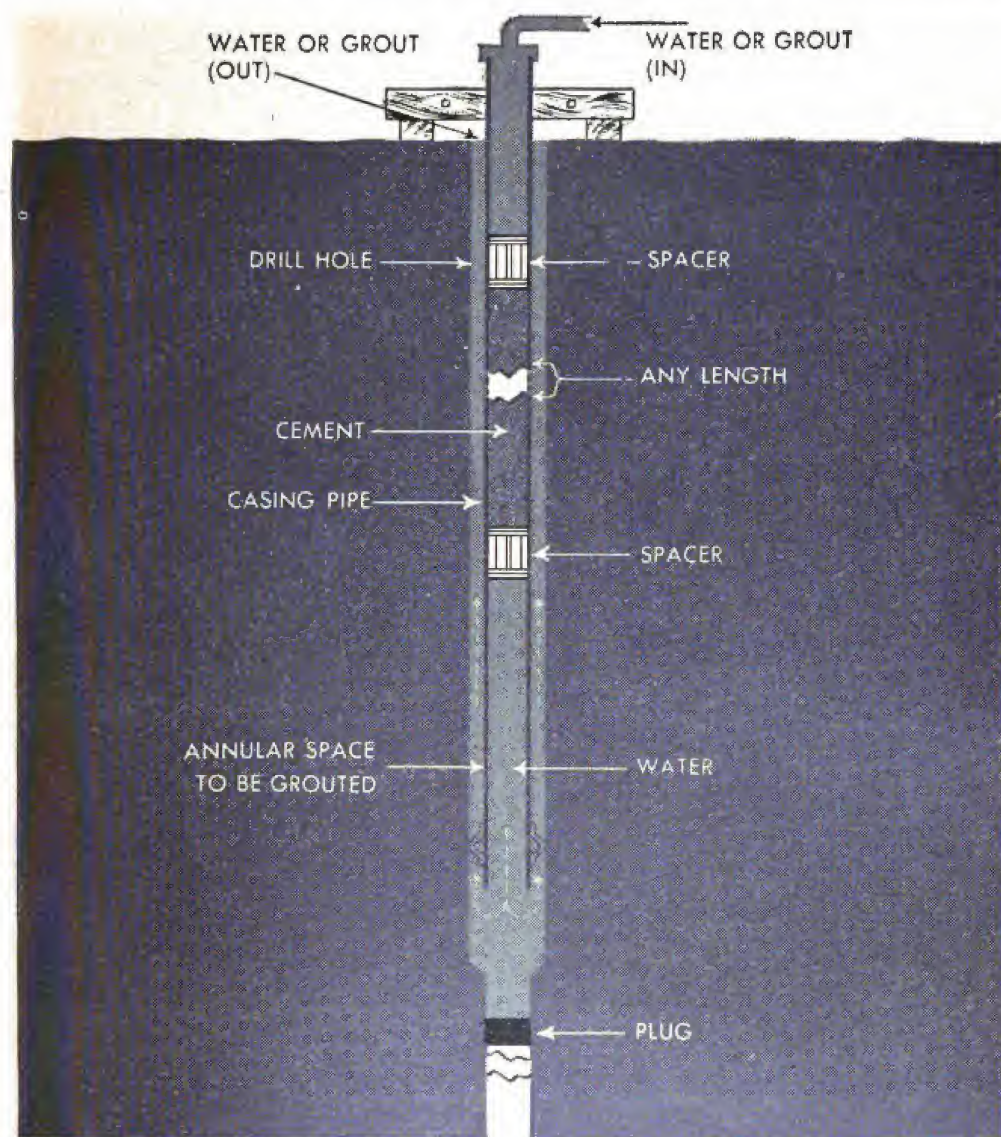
An arrangement for placing cement grout through casing pipe (courtesy Halliburton Oil Well Cementing Co.).
